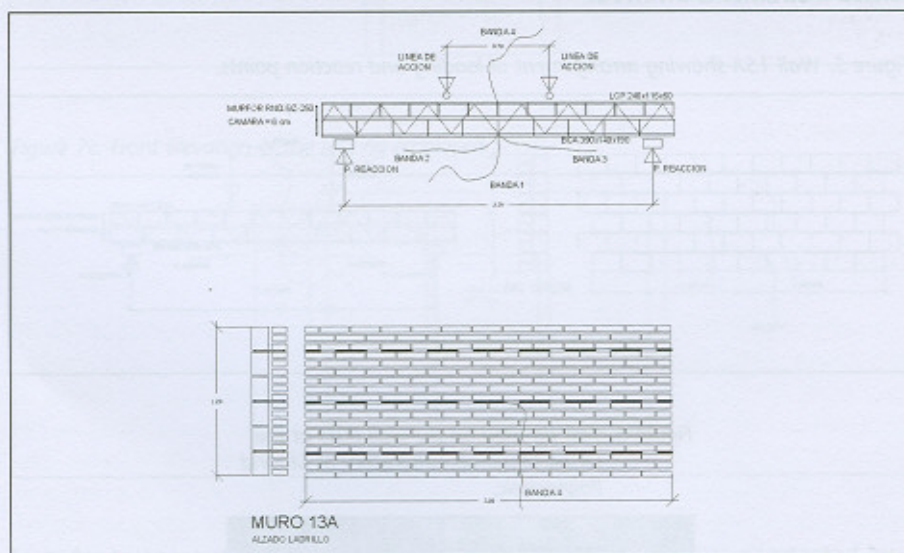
Wall 13A showing arrangement of loading and reaction points.
